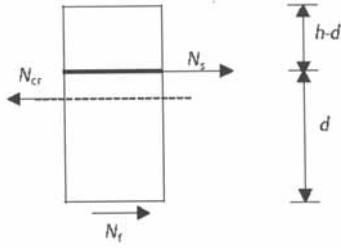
Concrete pavement (thickness h) with a single reinforcement at distance d above the bottom of the concrete layer.
